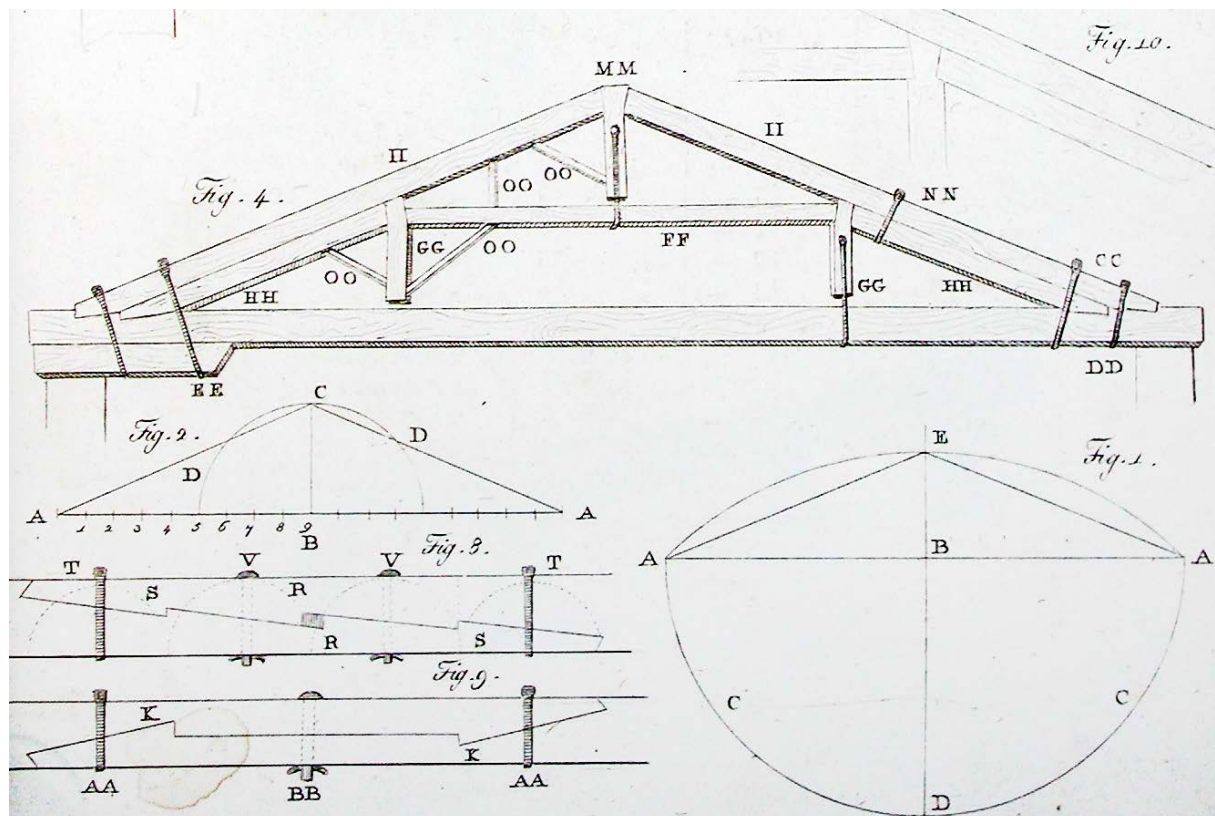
Truss with three monks and details of the couplers between two half beams to form a single link, table LXVI.
